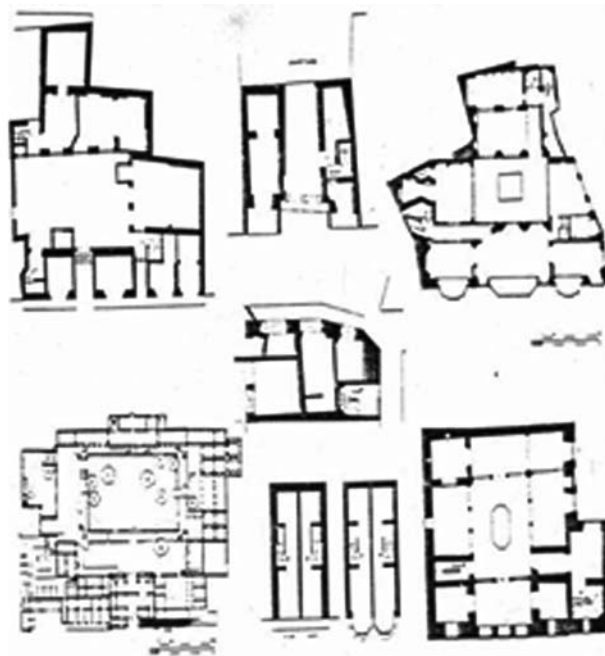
Layout Plans of Traditional Courtyard Houses in Lahore.
